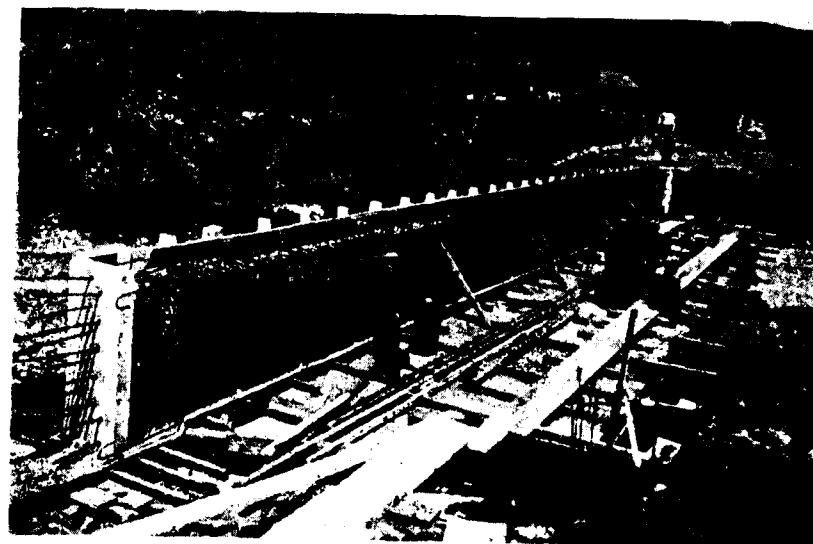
Abercrave Bridge—Manufacture of precast beam. The view shows shuttering on one side, anchor blocks at end, and parabolic cables.
